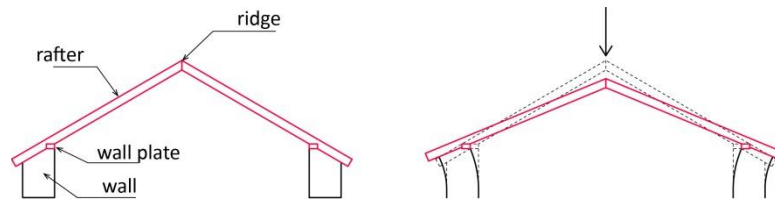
Common behavior of thrust-exerting roofing structural systems
